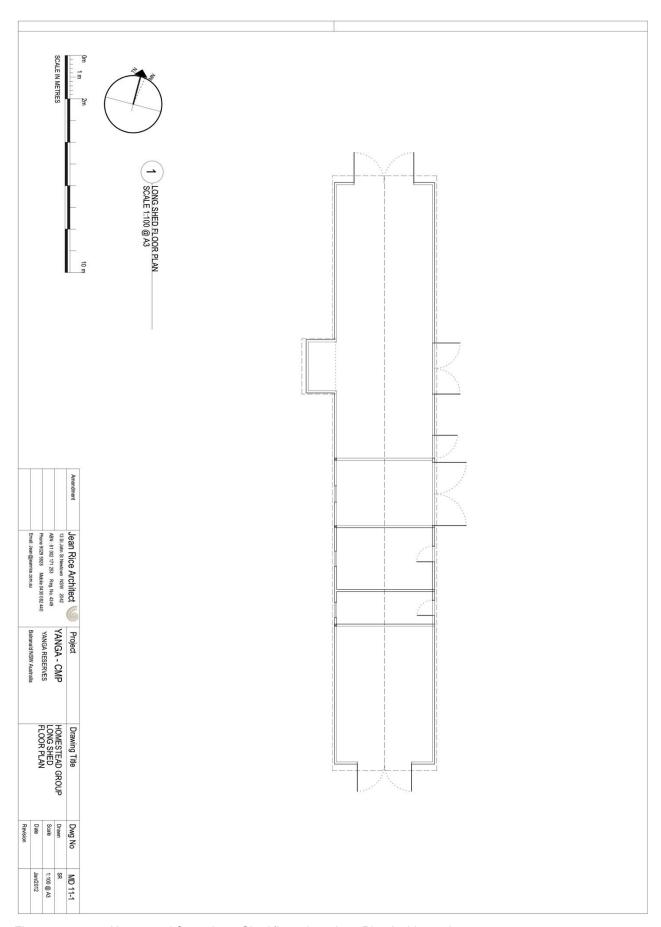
Homestead Group Long Shed floor plan.. Jean Rice Architect, site assessment 2009.
